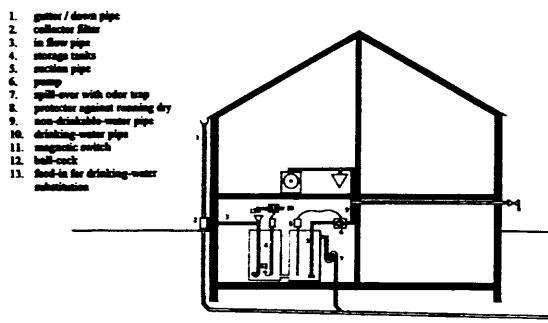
Rain water storage inside a building (Kennedy, 1997)
